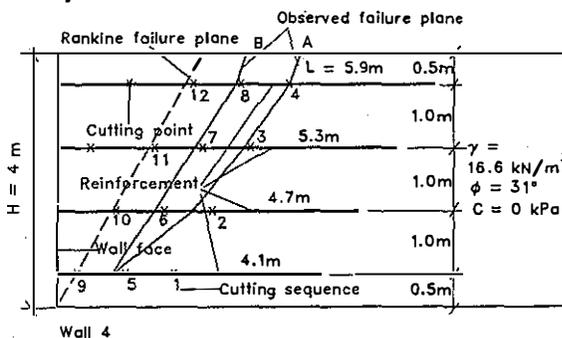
Geometry of Wall 4 and locations of observed failure plane (after Minami et al., 1987).
